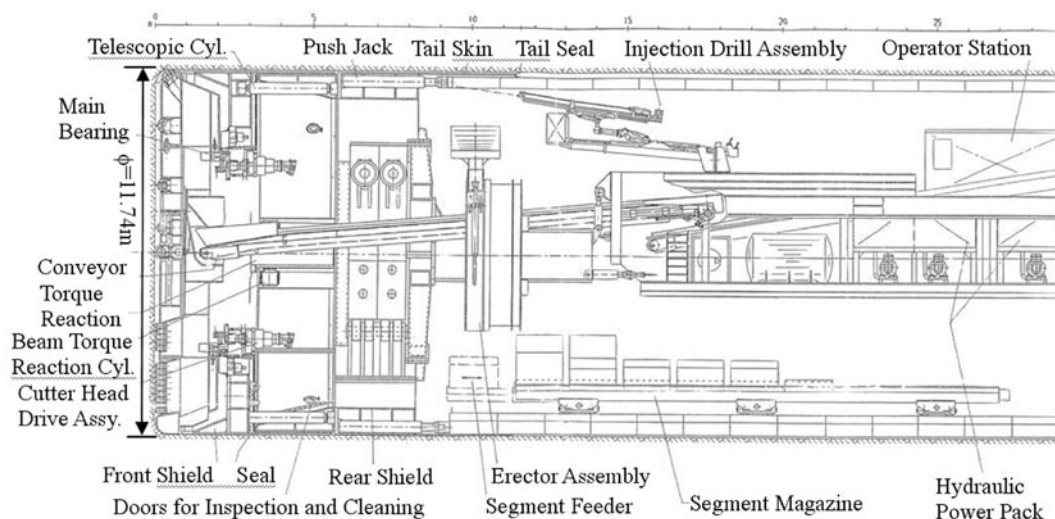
Longitudinal Profile of the Main Tunnel TBM of the Hsuehshan Tunnel
